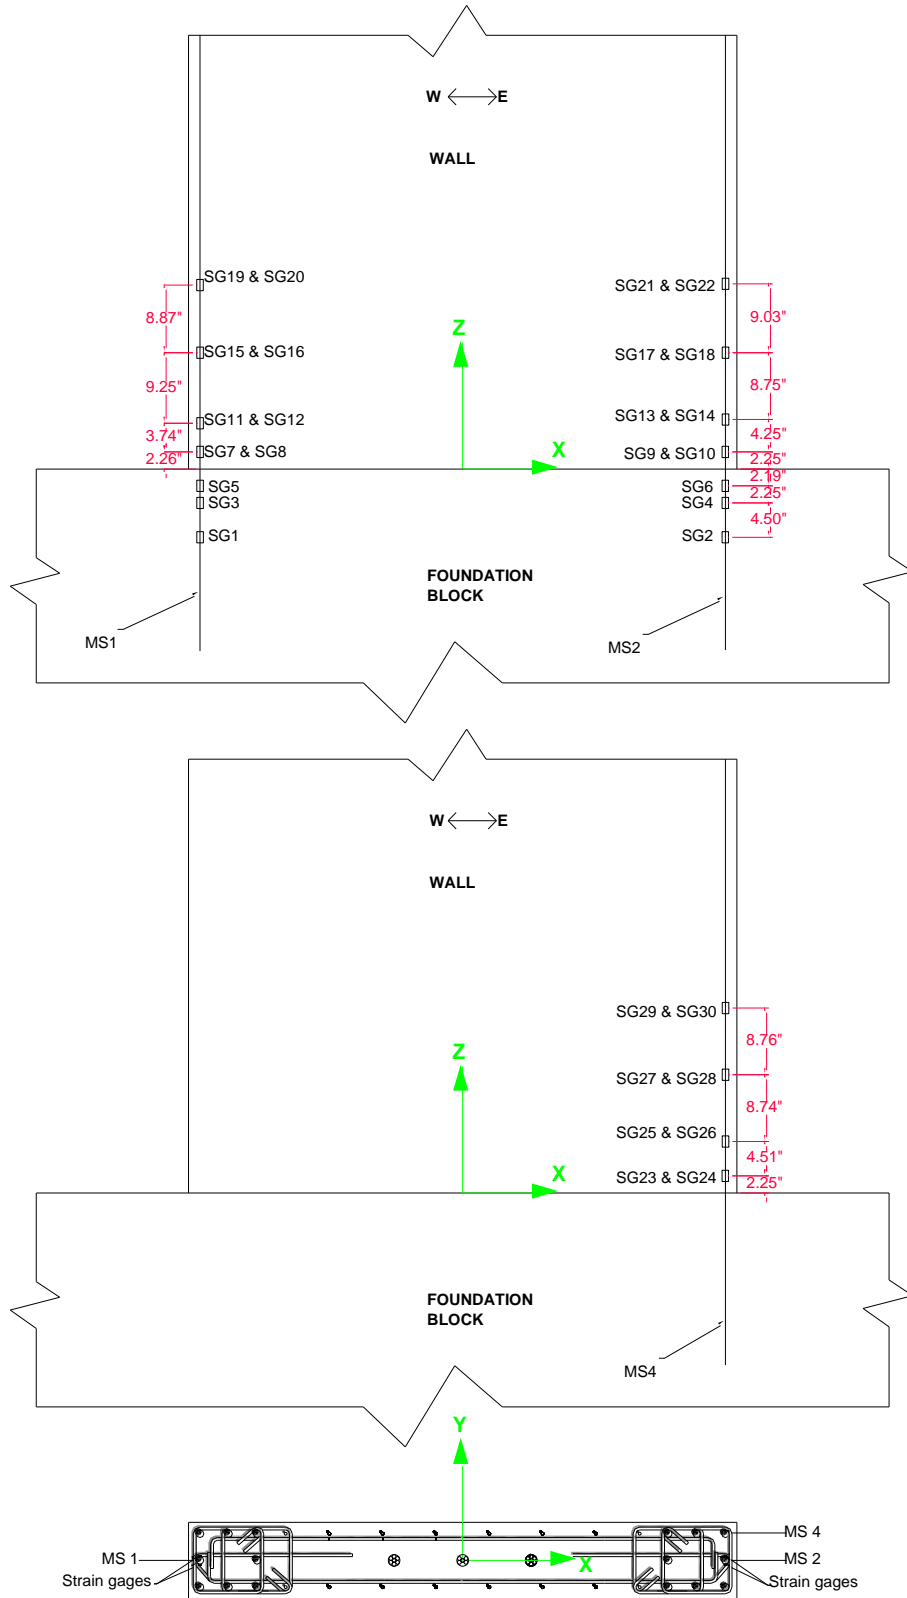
Strain gauges on longitudinal steel reinforcement on Wall 2
